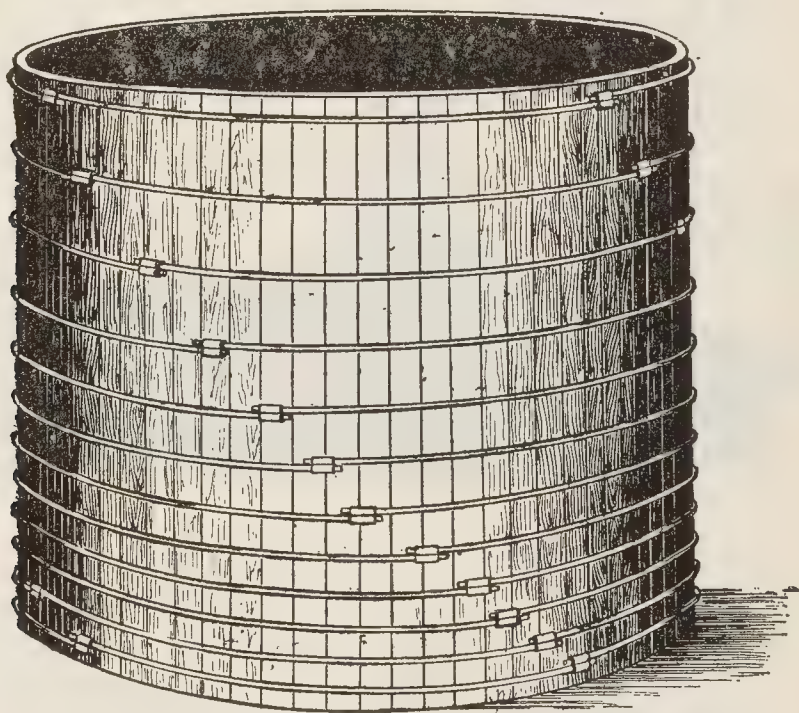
,815.—Cylindrical wind mill tank showing staves and retaining steel hoops.
